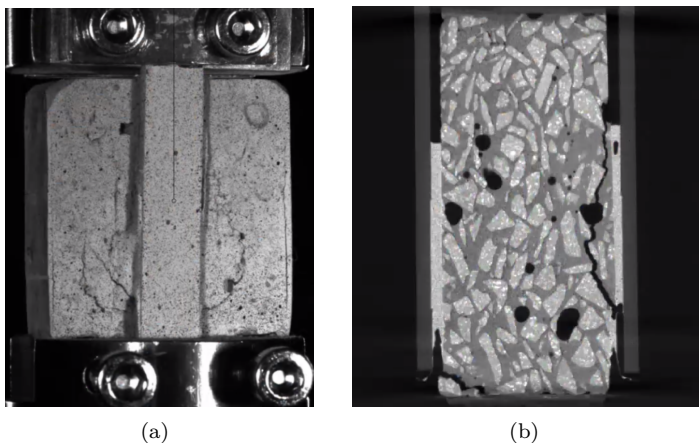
Fracture in far end supported double shear experiment: a) front view; b) side view (*courtesy of Matteo Lunardelli; iBMB, TU Braunschweig*)
